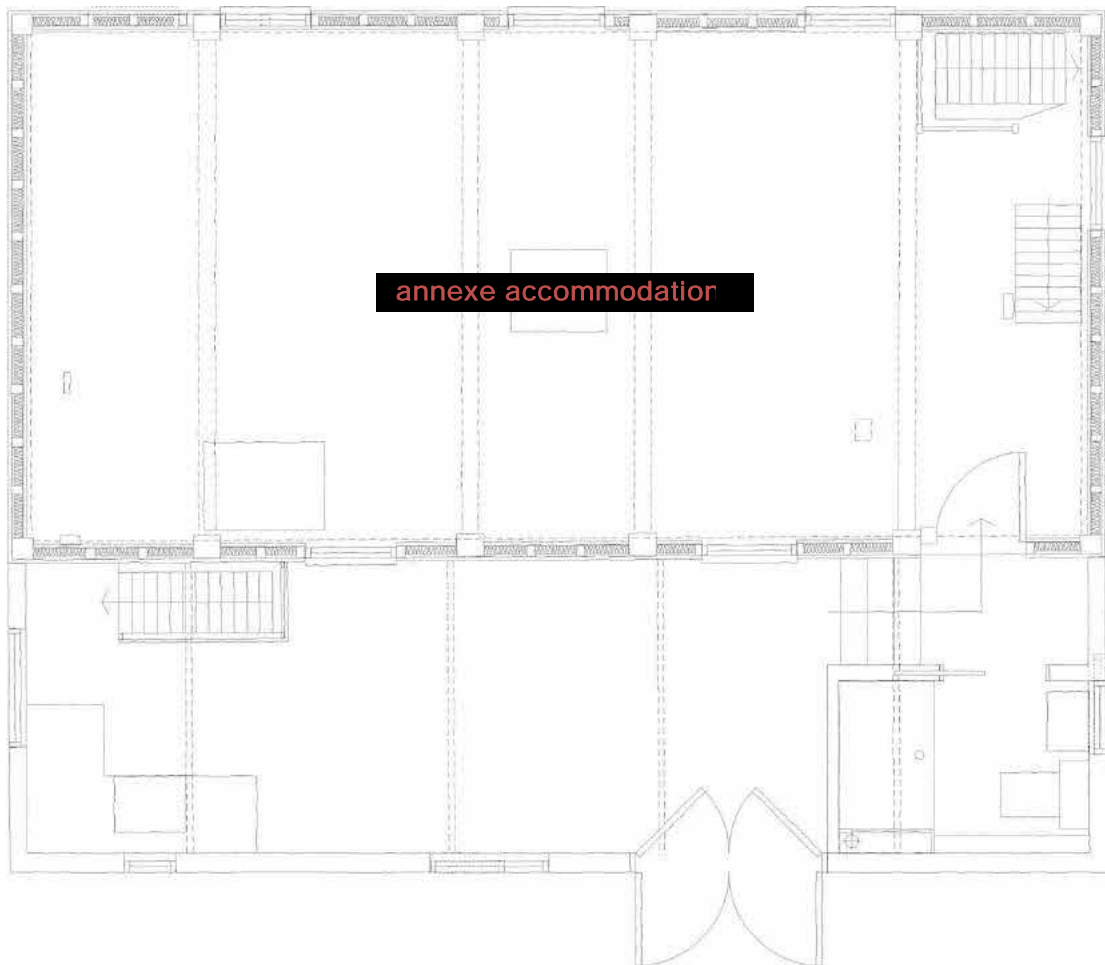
Proposed layout of 'stone floor' (Roger Balmer Design)
